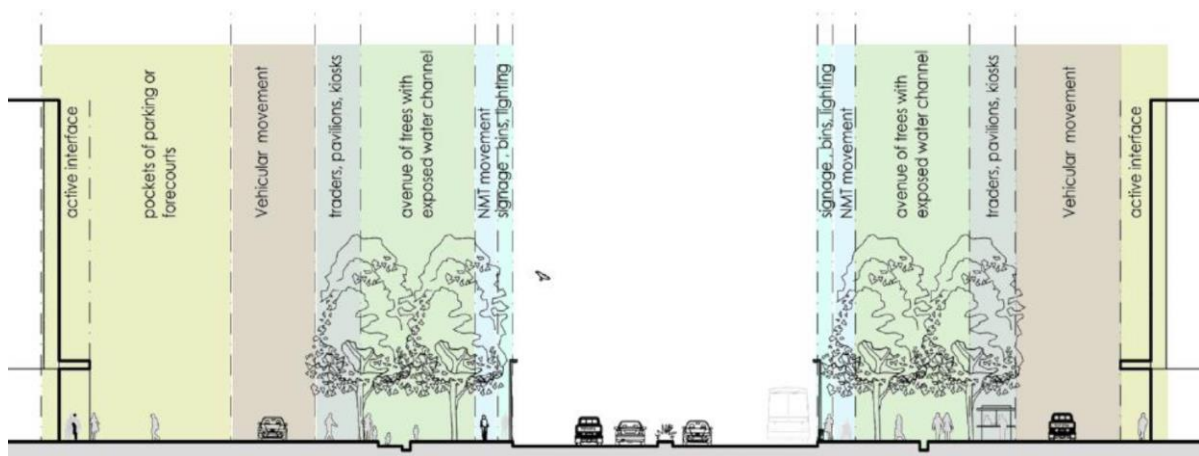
Cross section of proposed new George Corridor Street Scape
